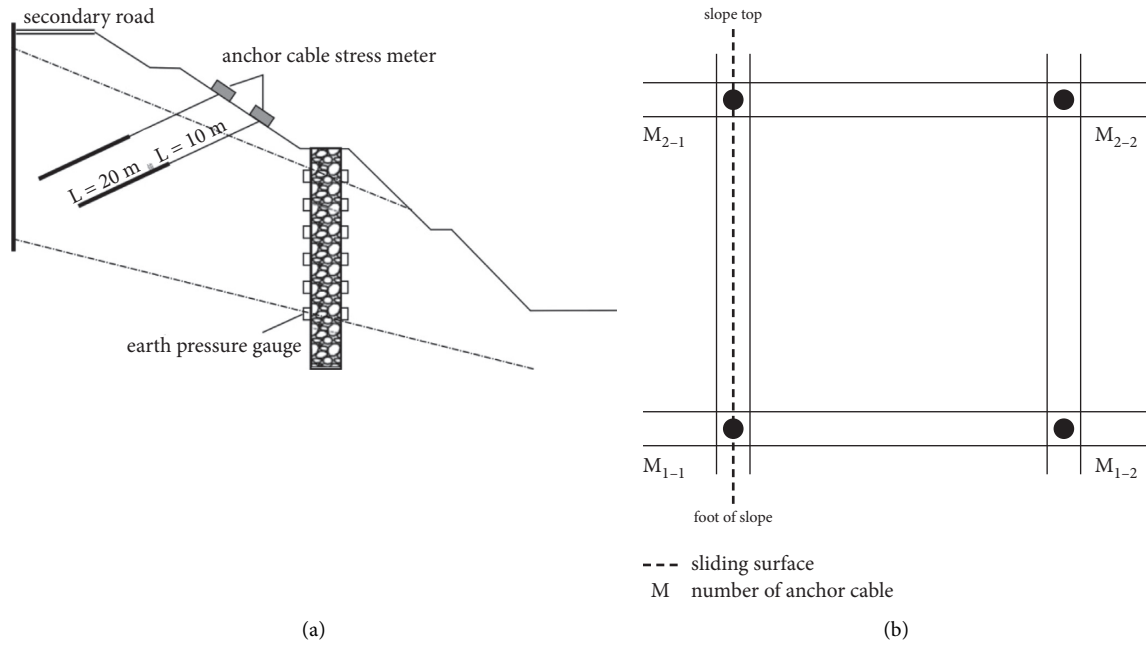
Monitoring point layout section of pile anchor composite structure. (a) Layout of earth pressure gauge. (b) Anchor cable number and layout plan.
